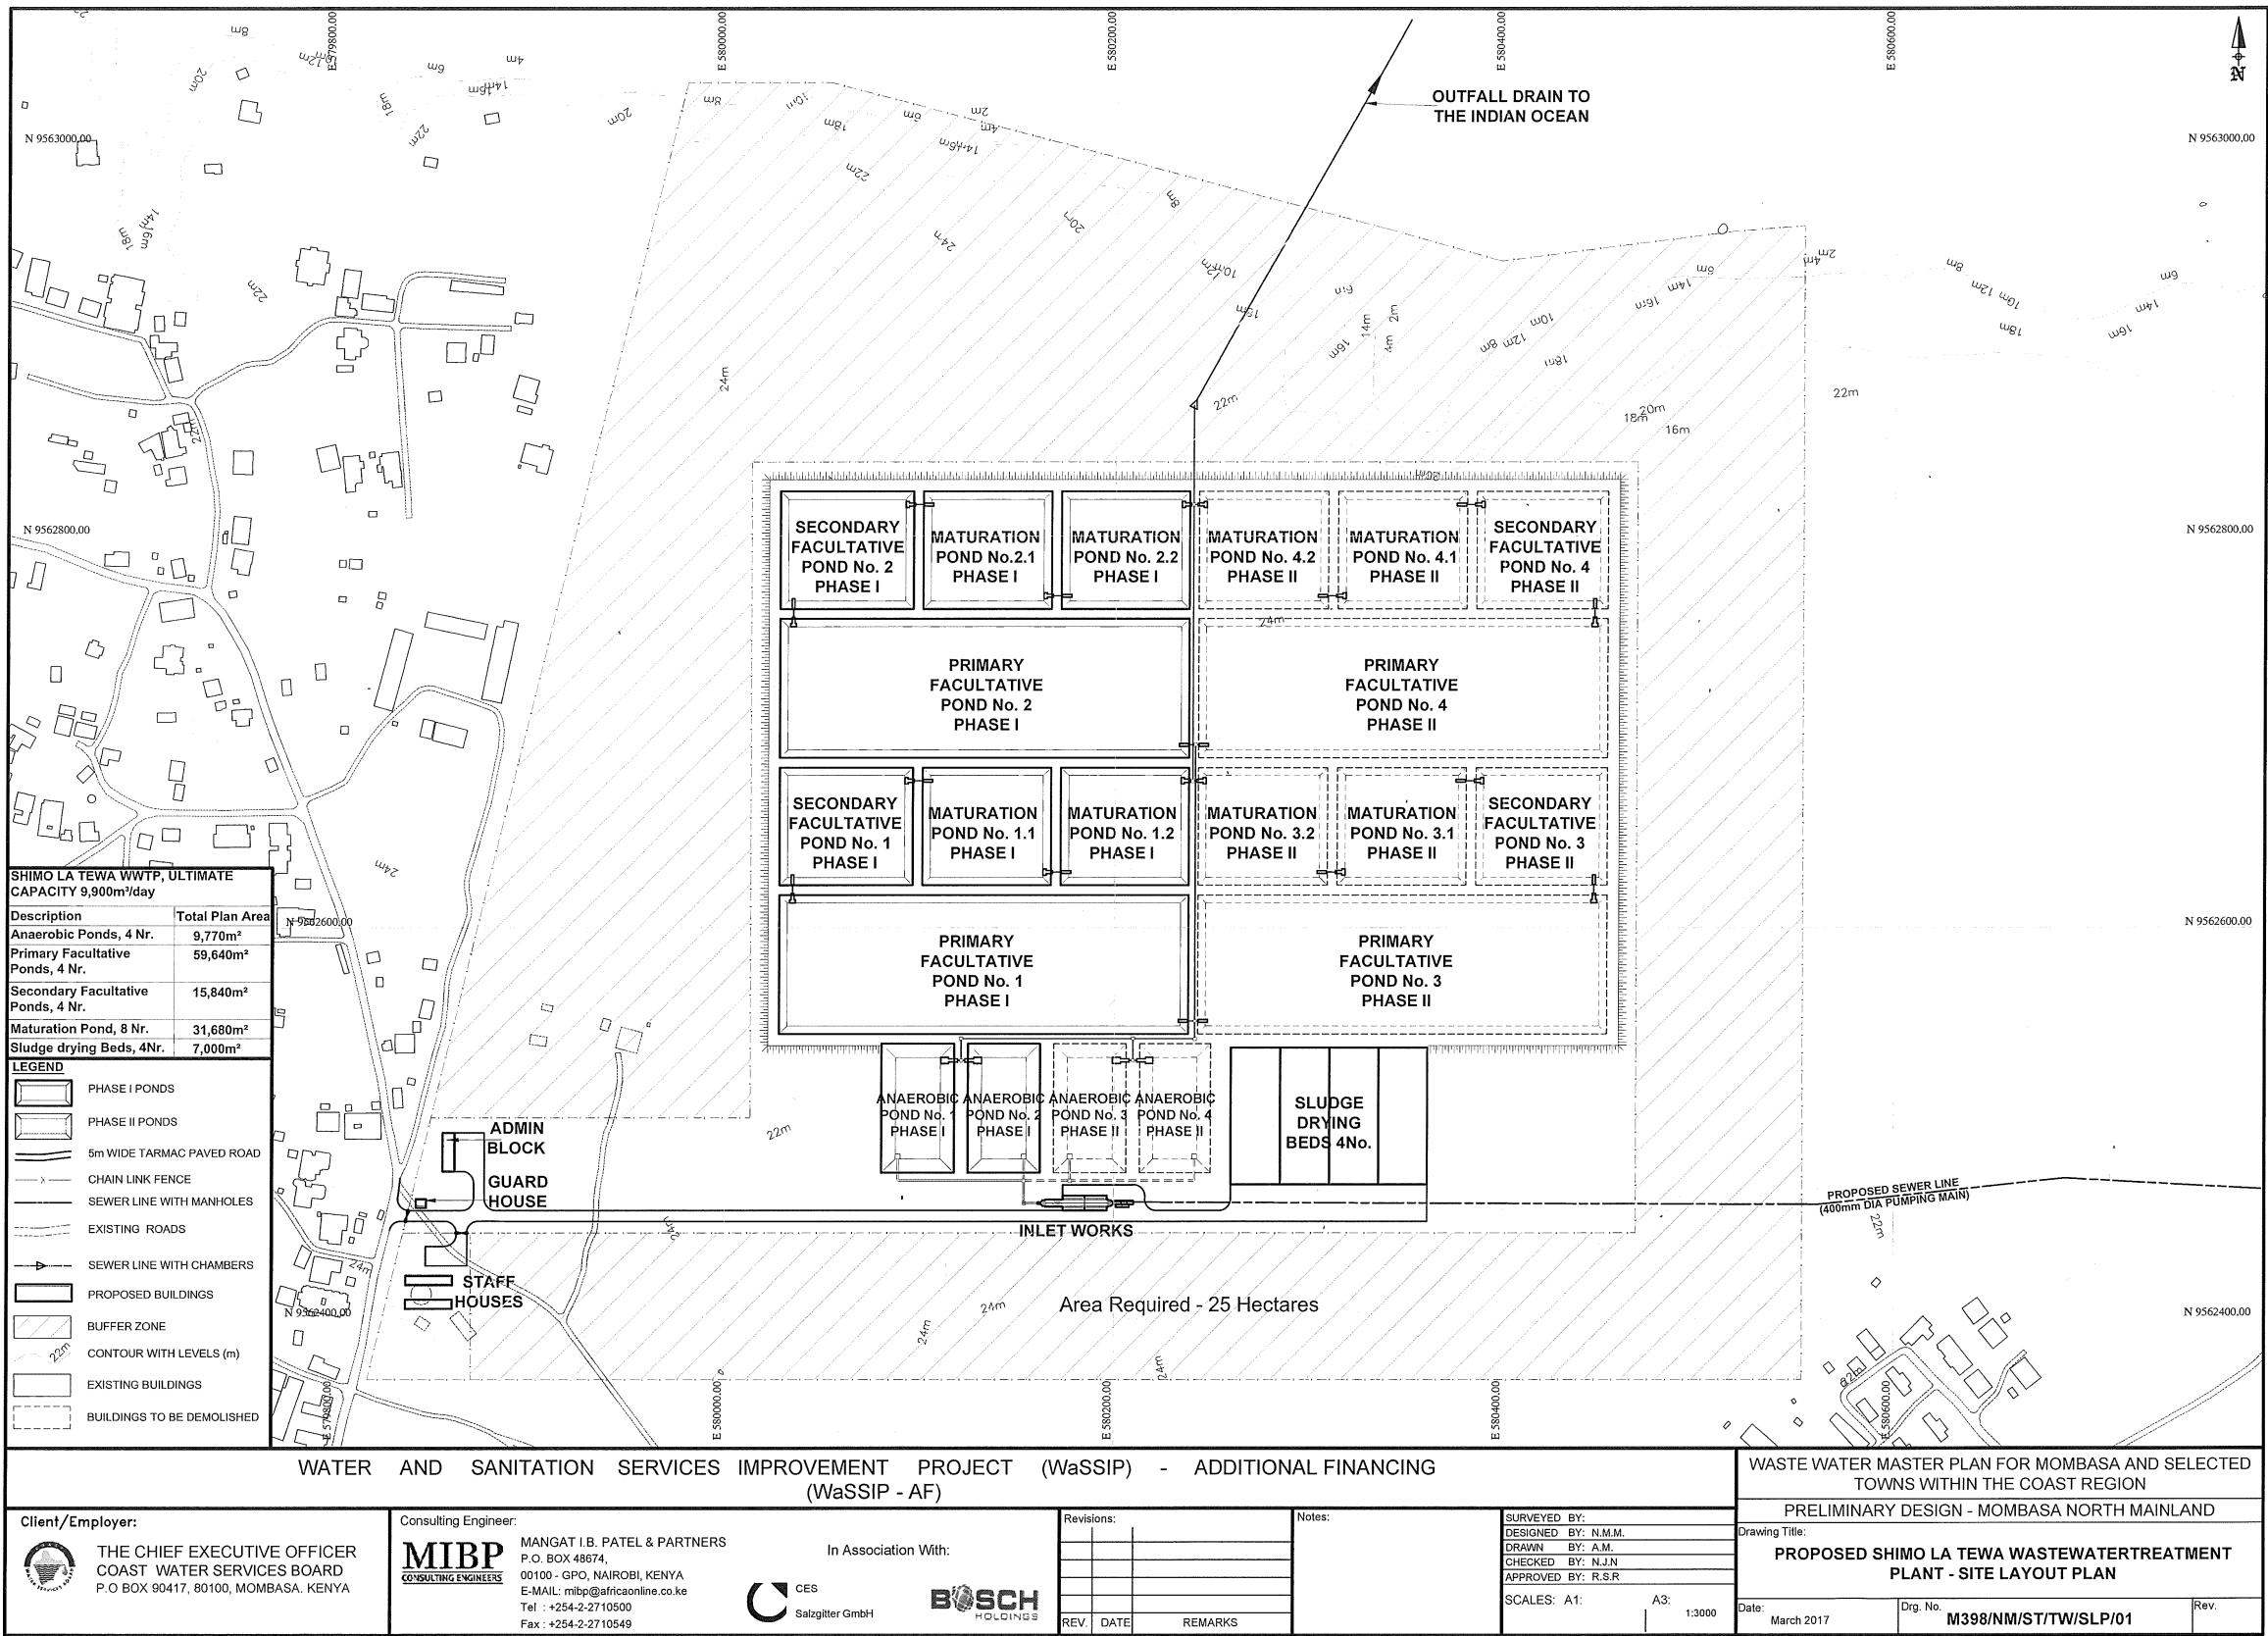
Site Layout Plan for Proposed Waste Water Treatment Plant - Shimo la Tewa
